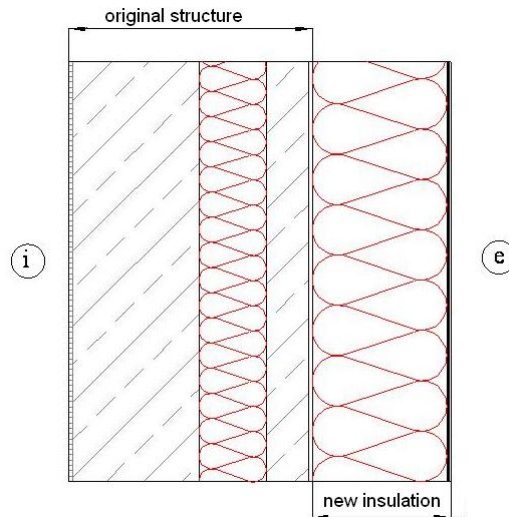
Typical project of reconstruction of buildings – adding a new insulation layer
